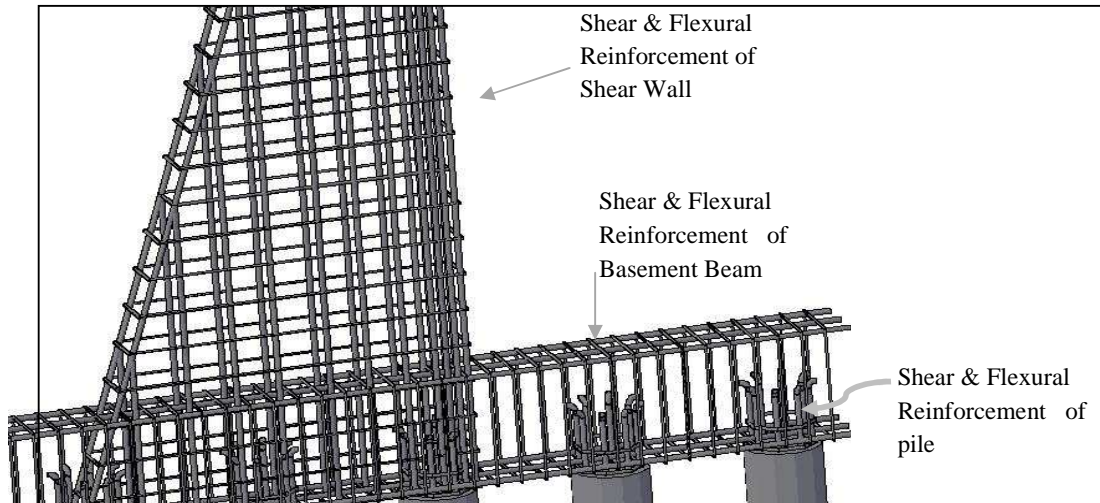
Arrangement of Shear & Flexural Reinforcement of a portion of Retaining wall.
